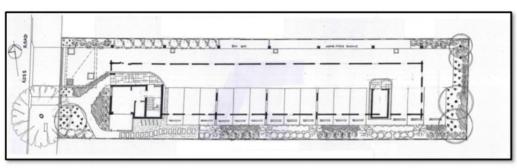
Landscape Plan prepared by Precincts landscape Architects
